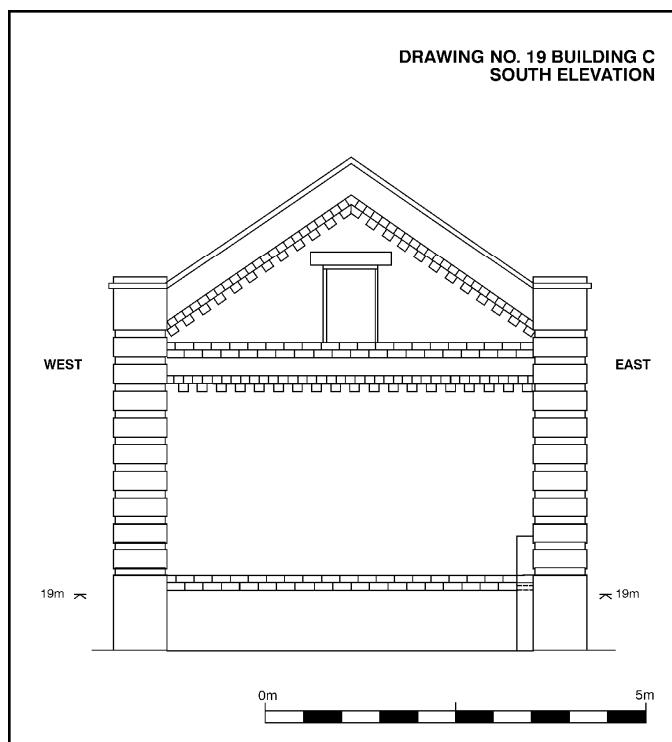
Survey drawing of the south elevation of Building C (scale 1:100)
